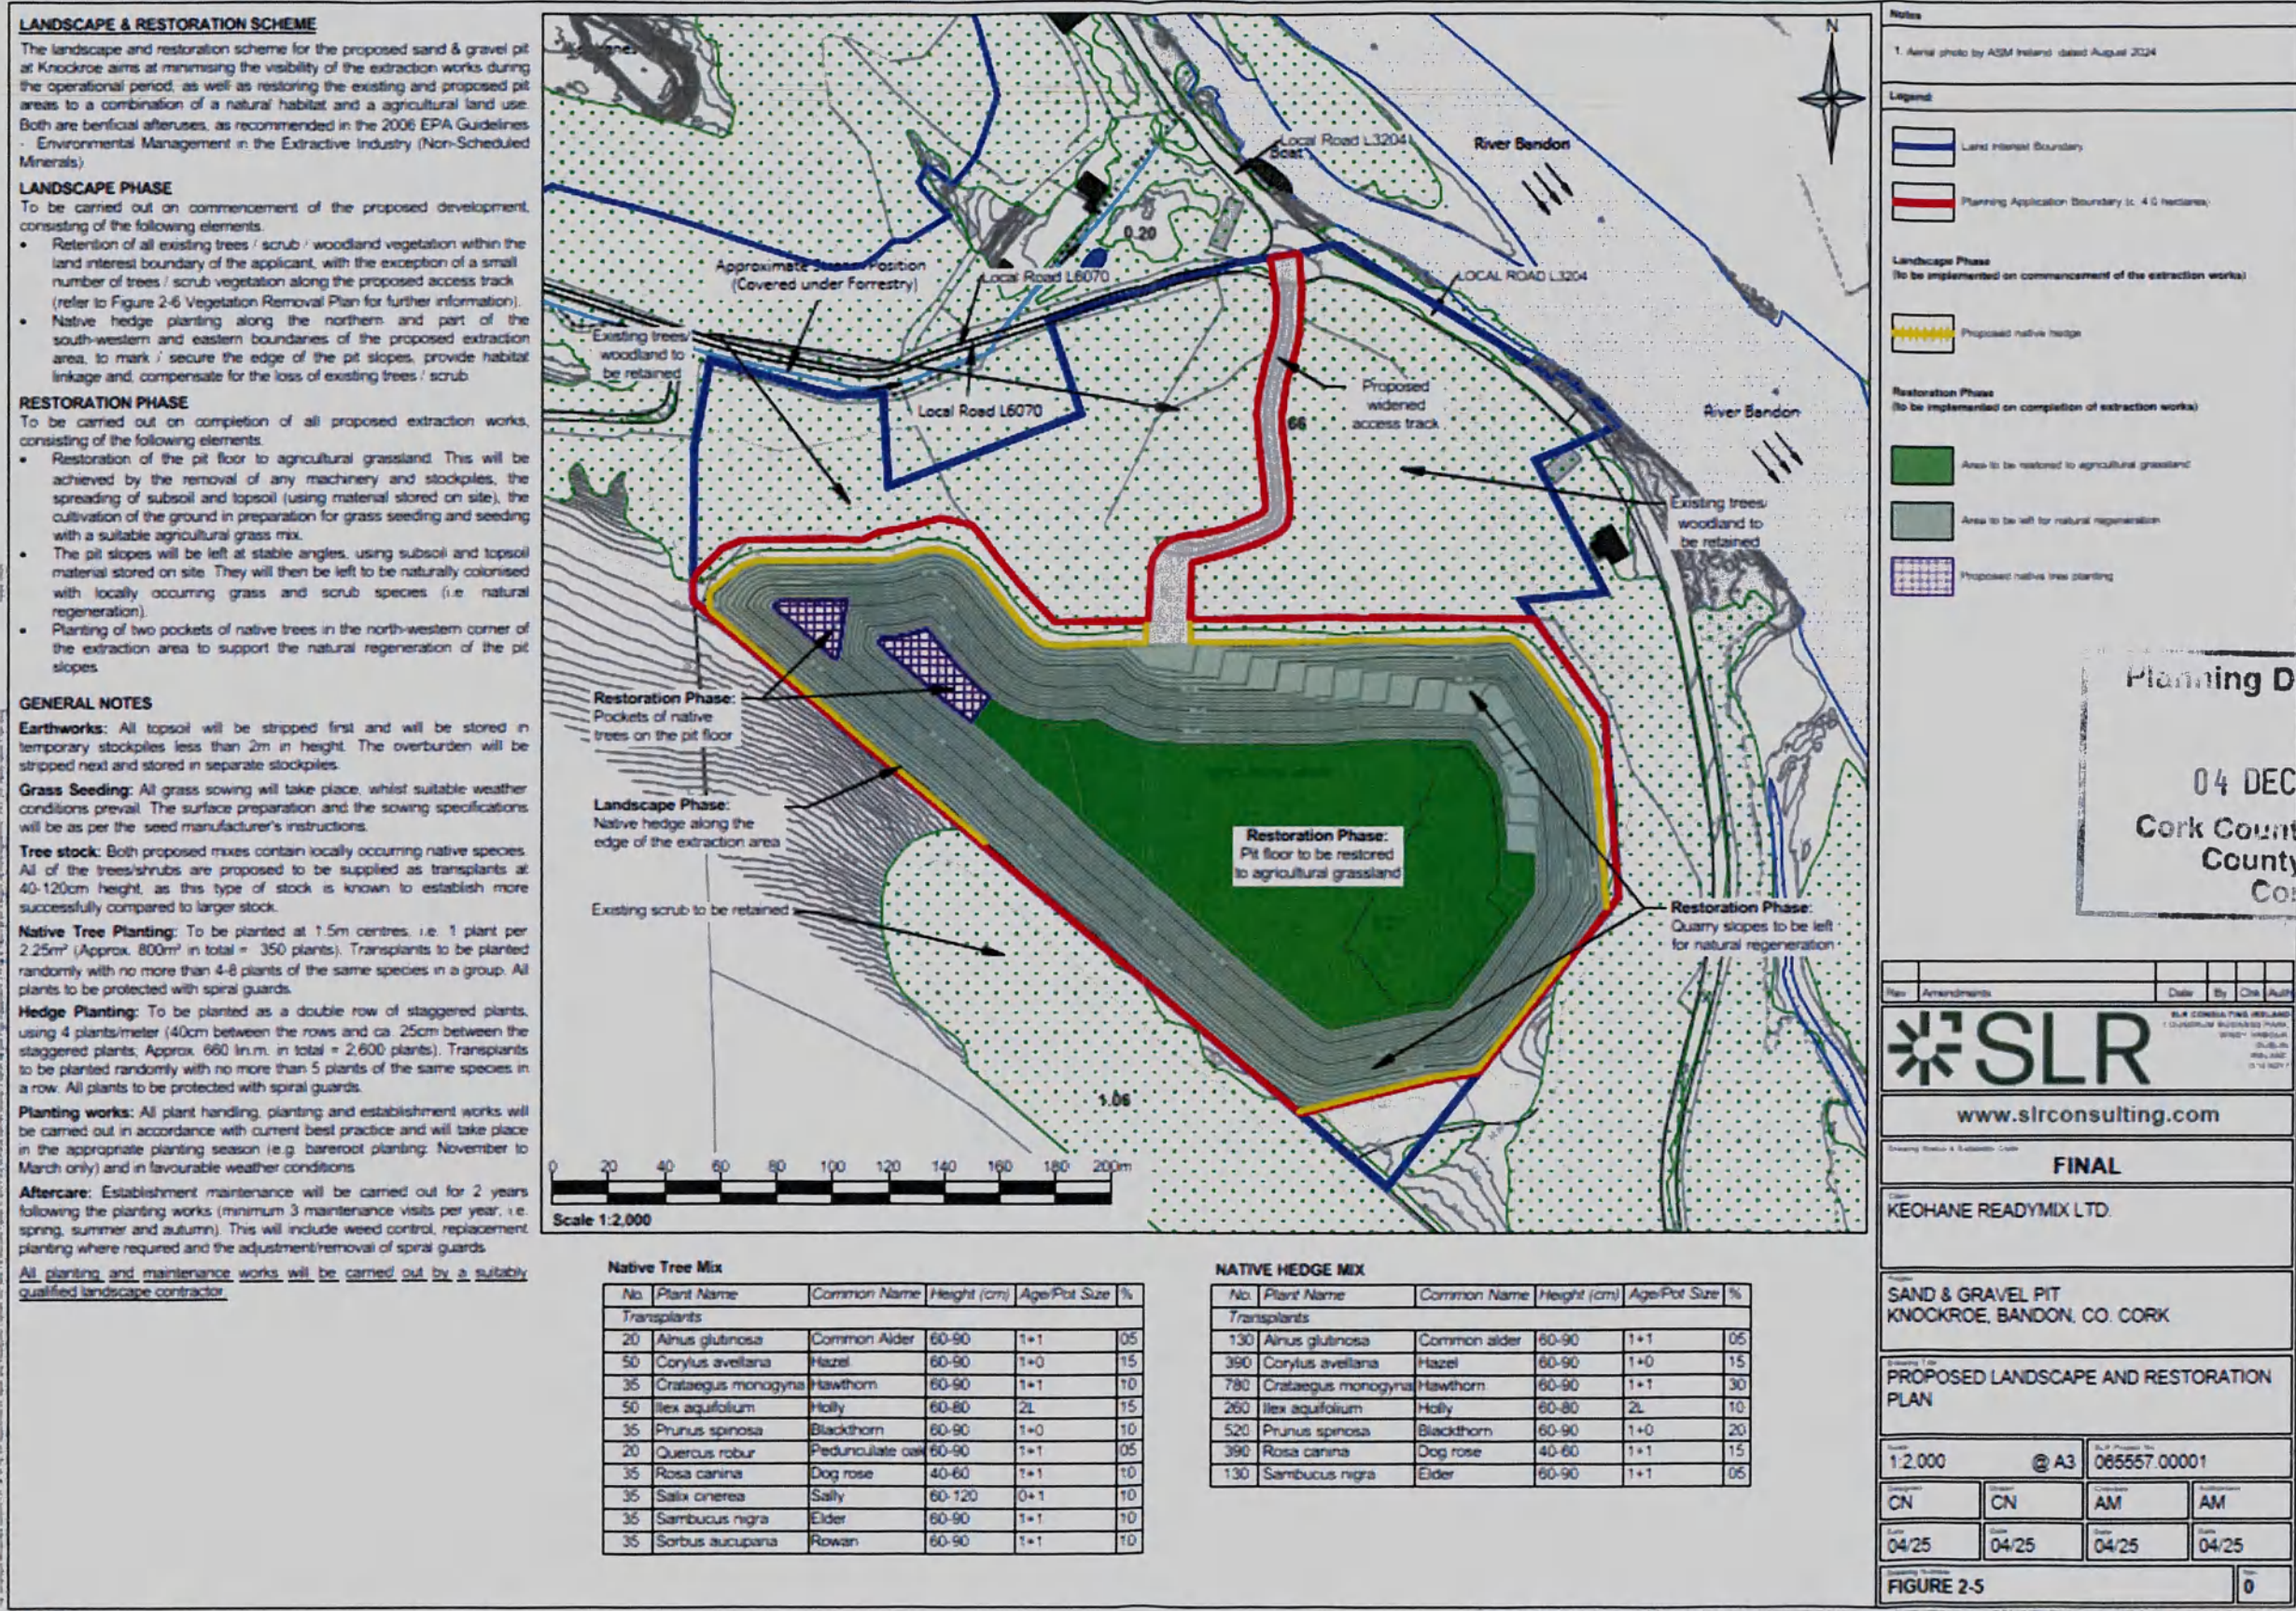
of EIA: proposed restoration plan showing replanting of native tree plots
